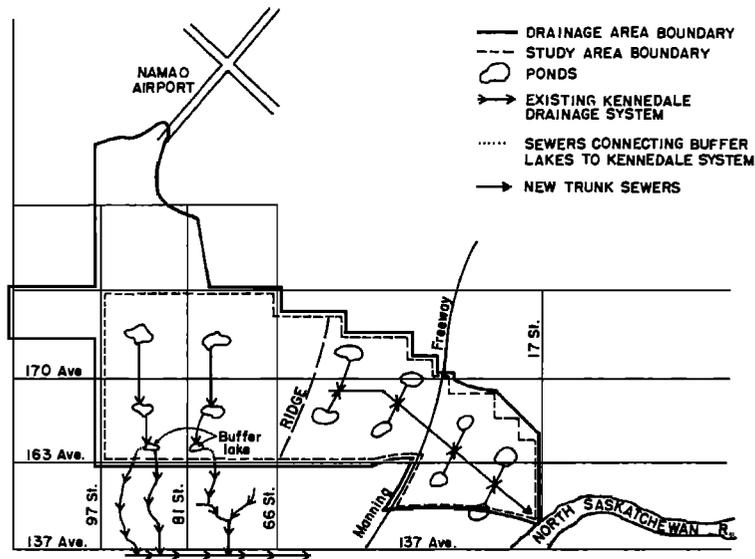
Schematic of alternative 3, controlled release to the 137 Avenue trunk sewer.
